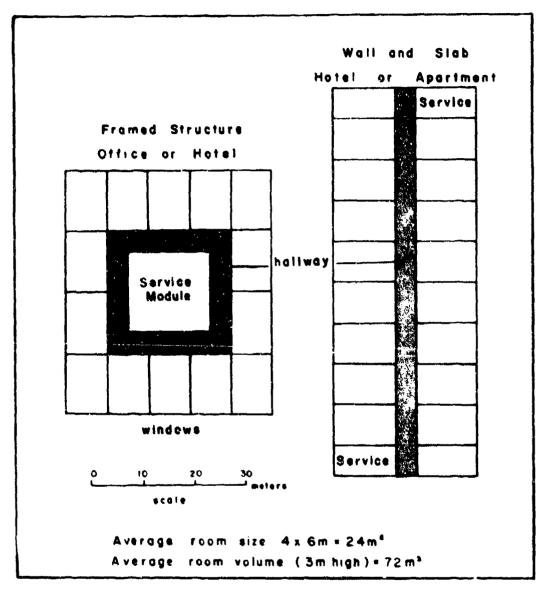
Architectural Factors Affecting Size and Configuration of Building Interiors
